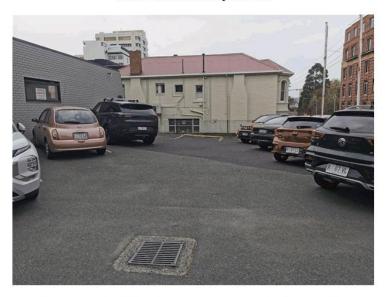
View of driveway to development site and (former) car park from Davey Street
